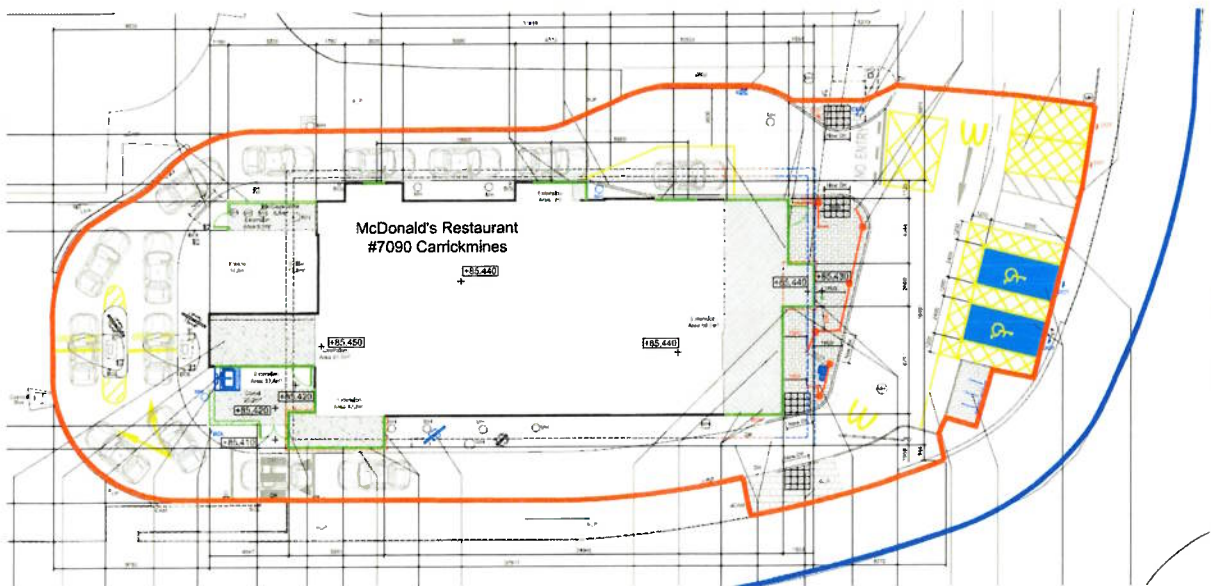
Proposed Site Layout Plan (subject site outlined in red)
